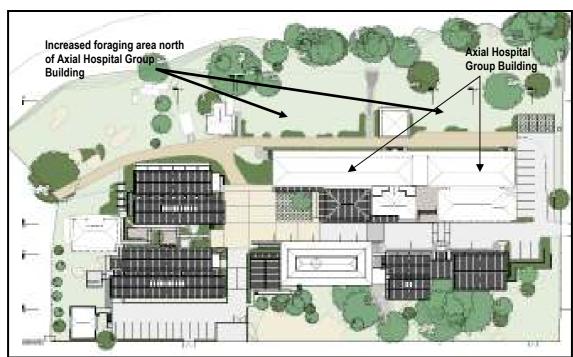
Proposed Site Layout (PPR) showing increase in foraging area. Source: Brewster Hjorth Architects
